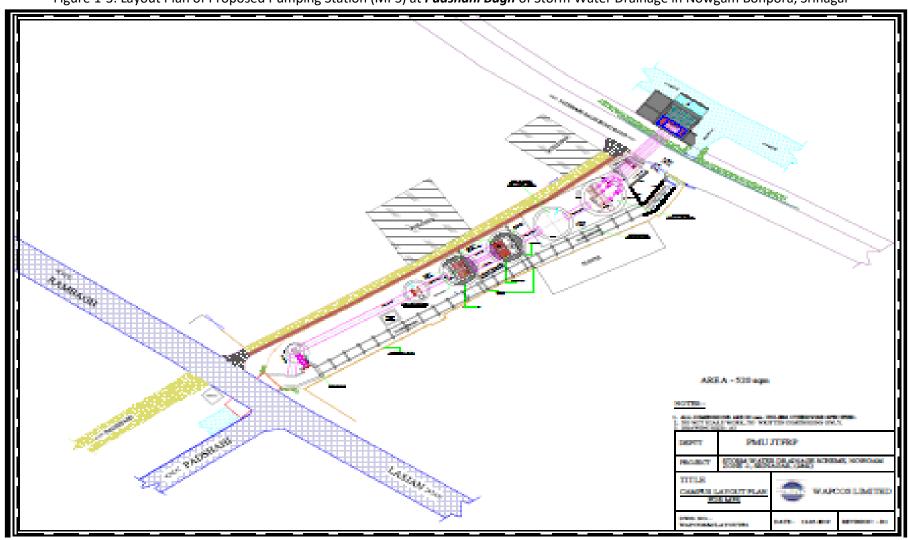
Layout Plan of Proposed Pumping Station (MPS) at *Padshahi Bagh* of Storm Water Drainage in Nowgam Bonpora, Srinagar
